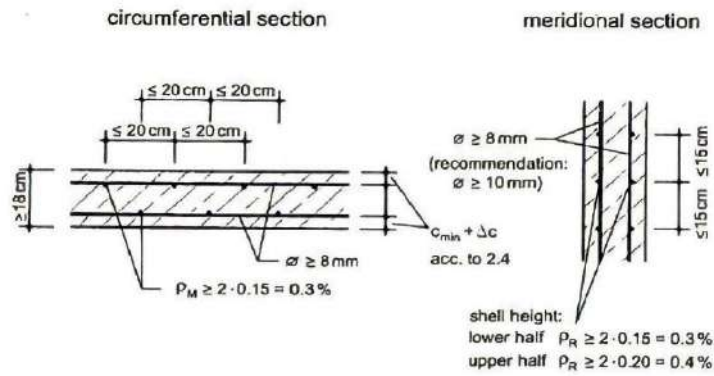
Typical cross-section of the cooling tower wall (VGB powertech, 2005).
